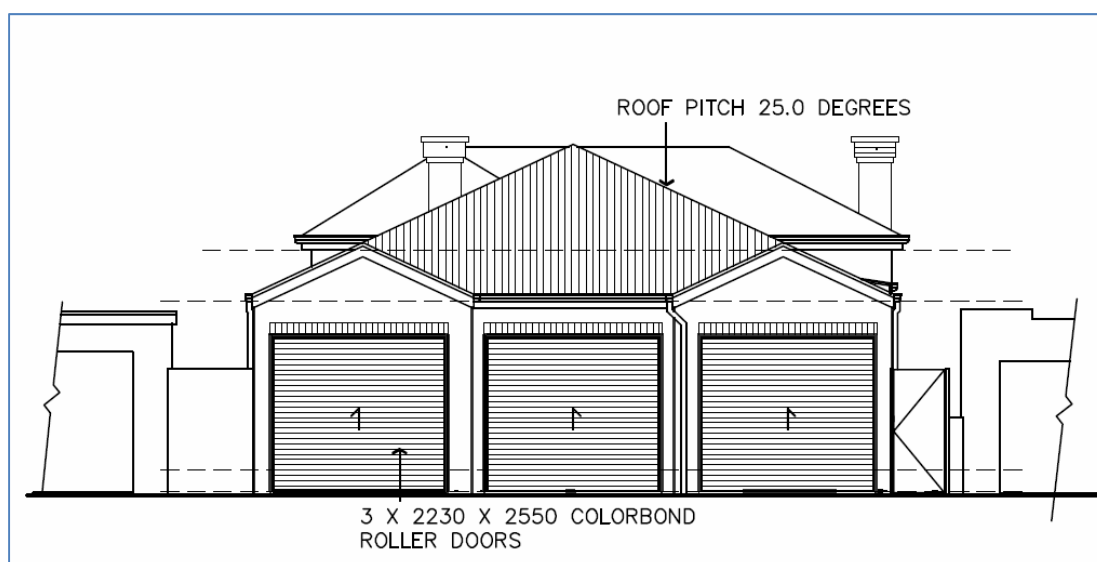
Garage elevation to Biroomba Lane (Source: DA plans)
